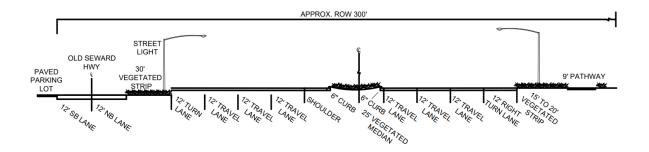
Seward Highway between 36th Avenue and Benson Boulevard
